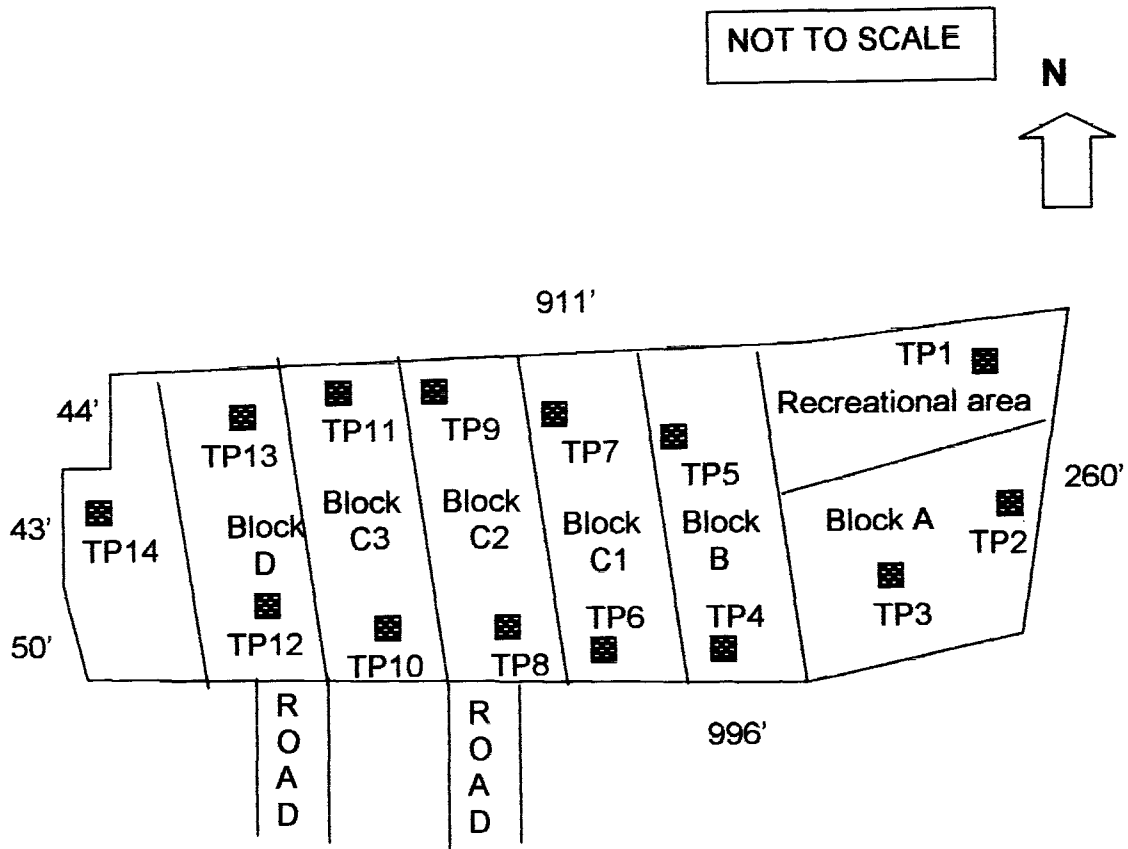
Layout Plan for Residential Buildings at Nagaram, Keesara (M), showing locations of trial pits.
